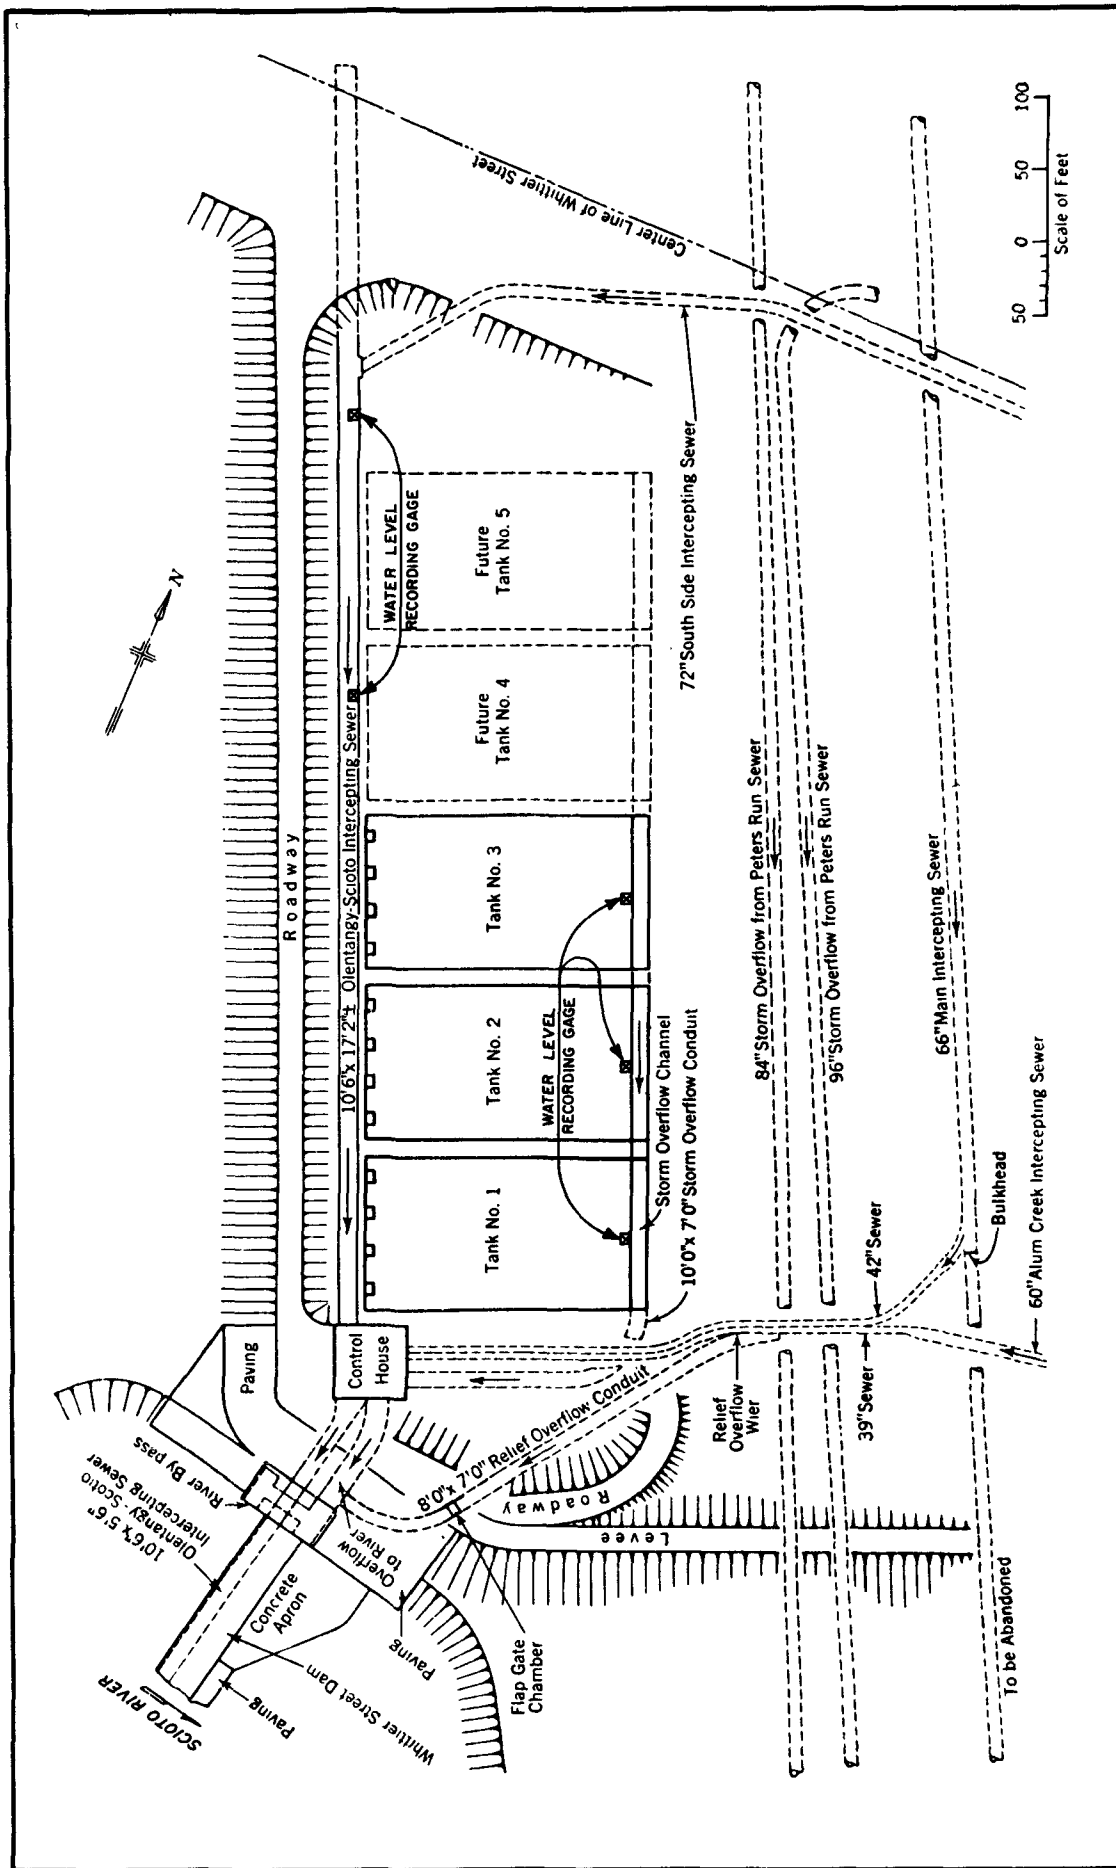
SITE PLAN OF STORM STAND-BY TANK FACILITIES
